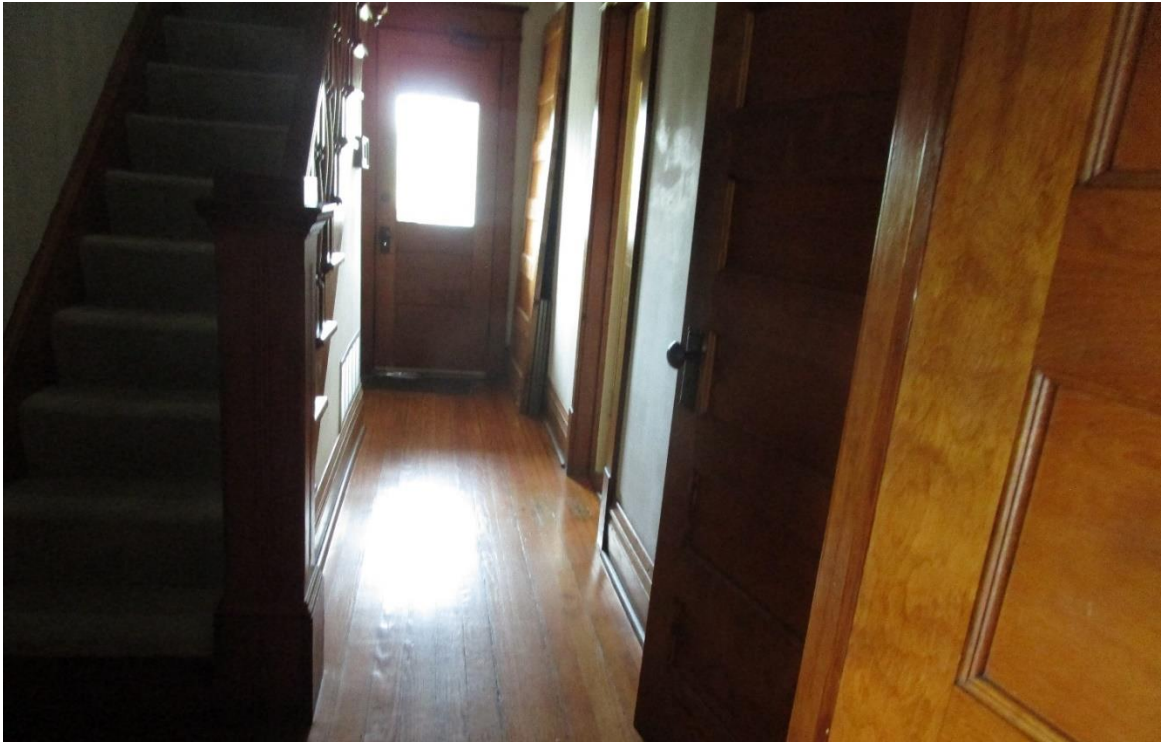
View of main hallway on first floor looking towards the west. Note some ripples in the hardwood floor.
